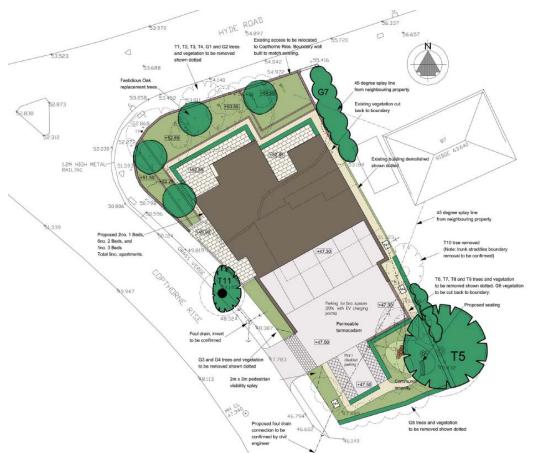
Site Plan – Ariel Perspective (Lower Ground Floor Plan)
